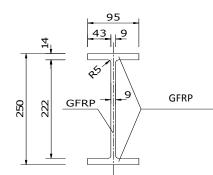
Cross-sectional details of the GFRP I-Beam (unit: mm)
